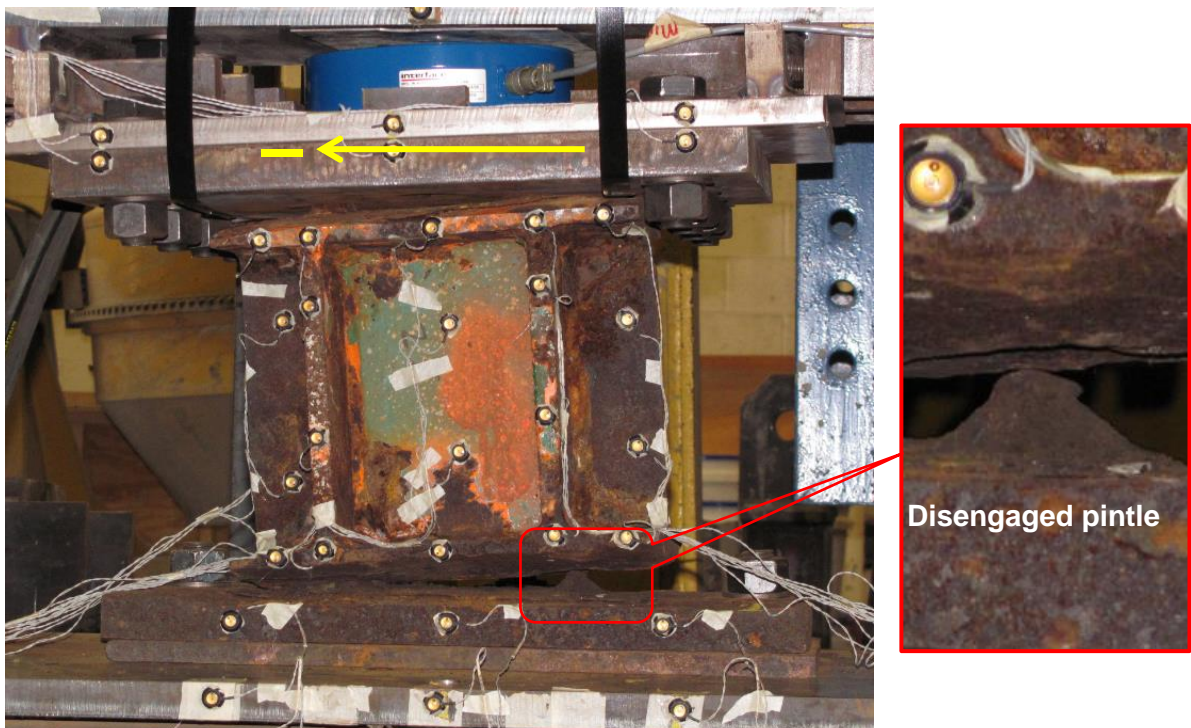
Test photographs of the as-received AR25 bearing under negative monotonic loading
